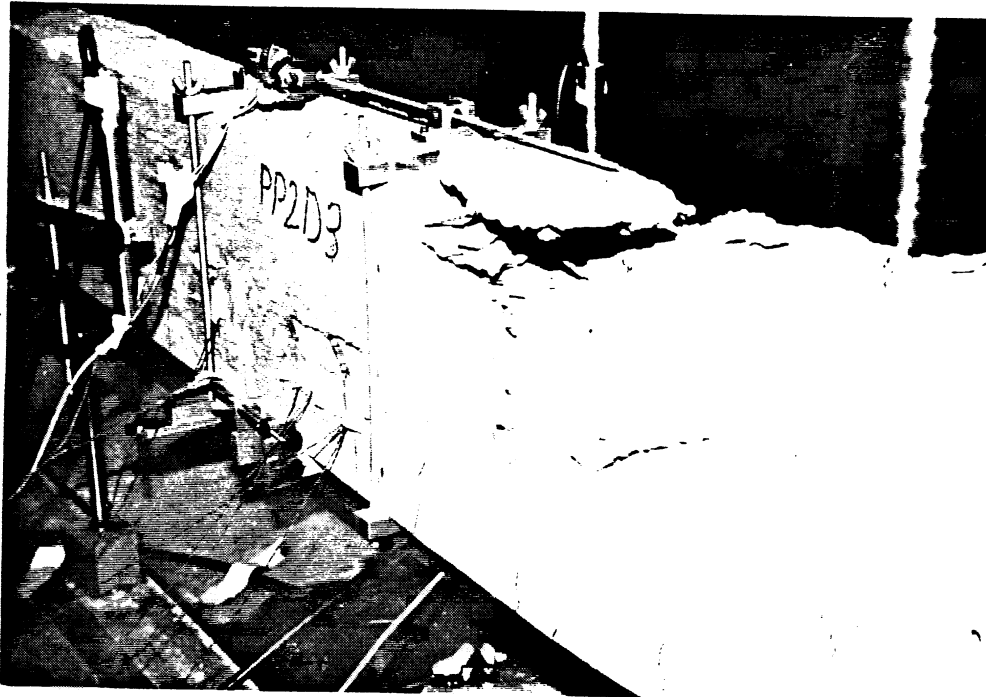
Typical Beam Failure: PP2D3
